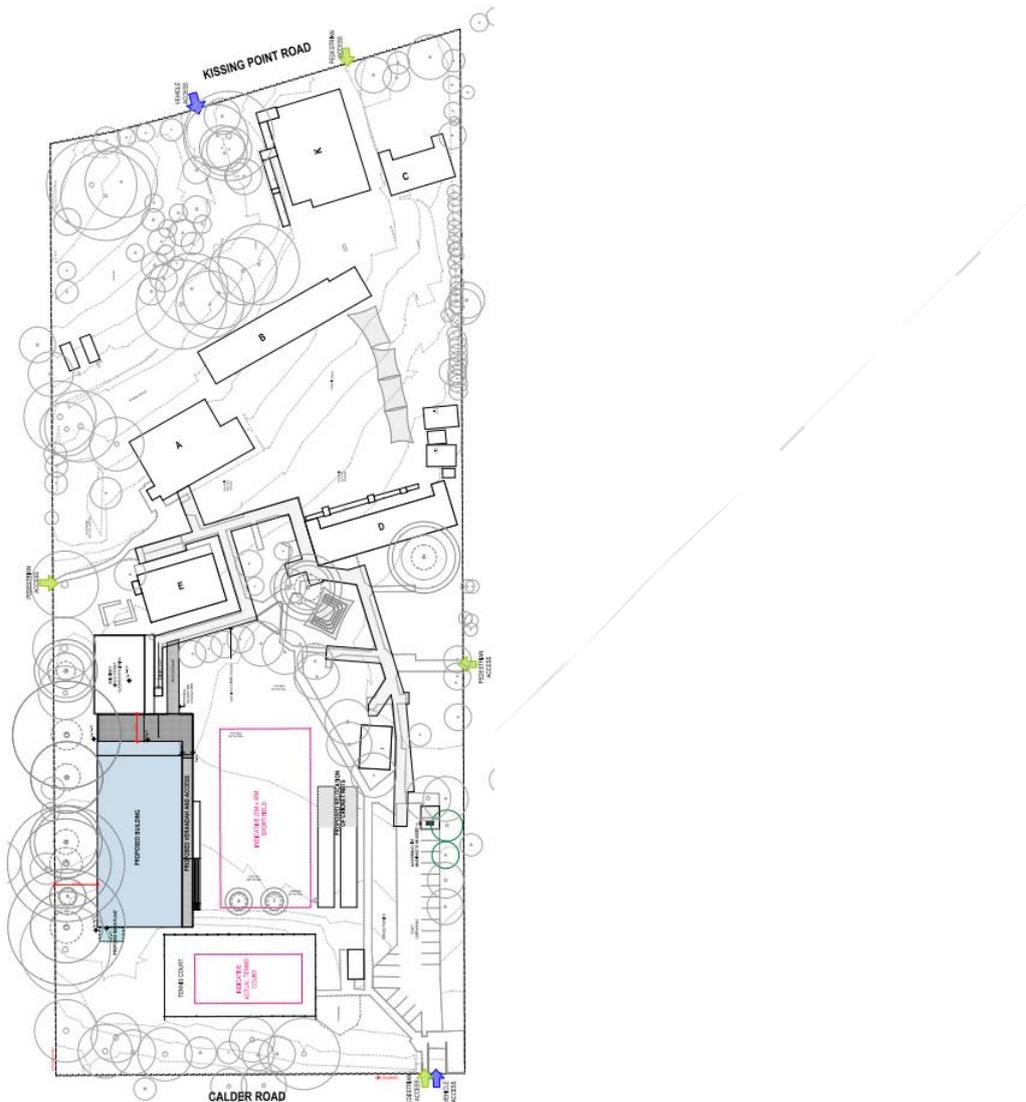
Proposed Scope of Works (Source: Fulton Trotter Architects, Proposed Site Plan (Rev P5))
